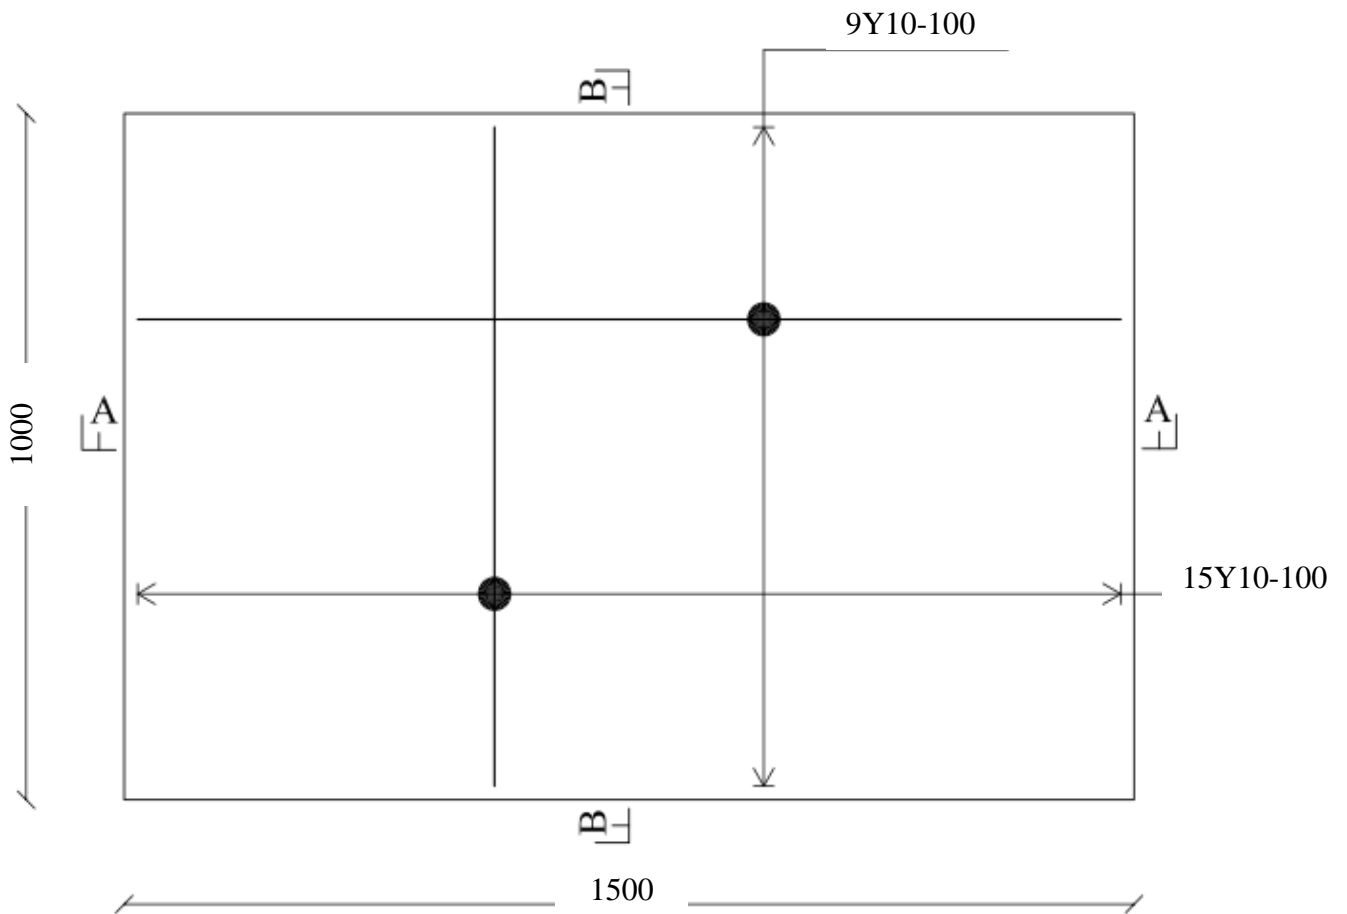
Slab reinforcement layout (Dimensions in mm)
